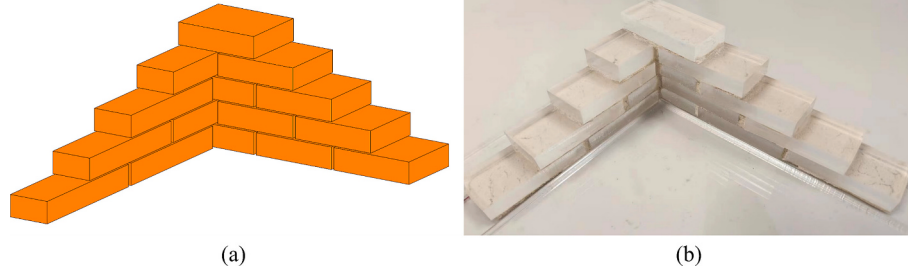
(a) Theoretical corner wall model, (b) Built corner brick wall.
